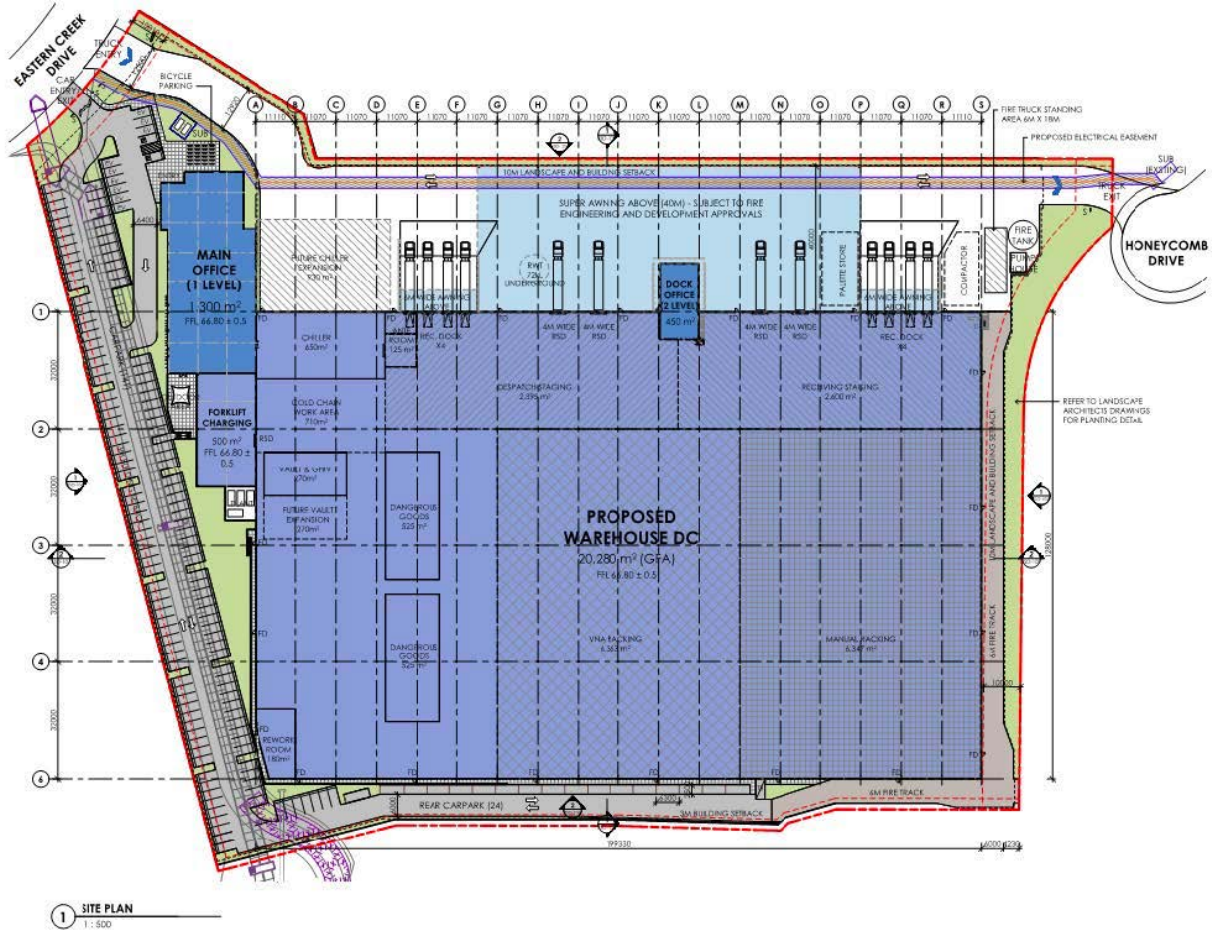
Site layout – source: EIS, Willotree Planning, December 2021
